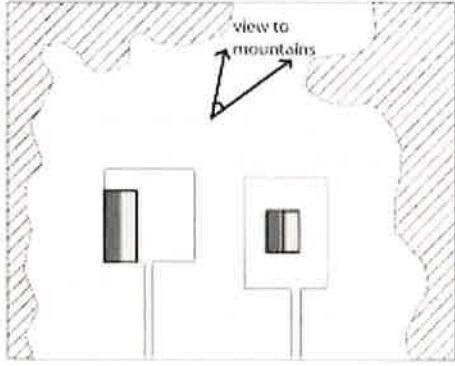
NO. Building placement diminishes open space and blocks view.
